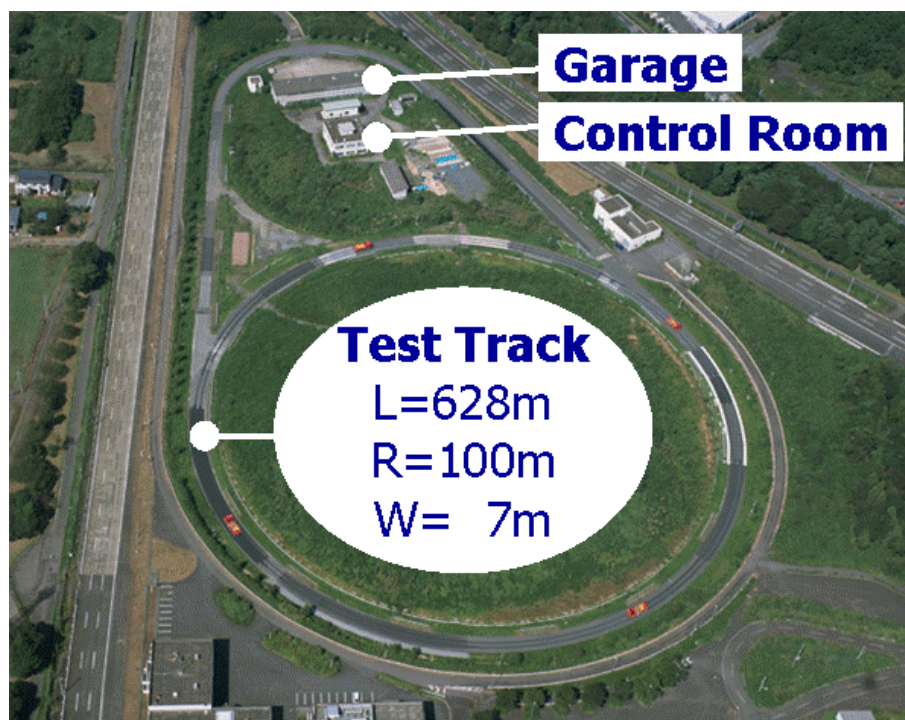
Aerial view of the Pavement Test Field at PWRI
